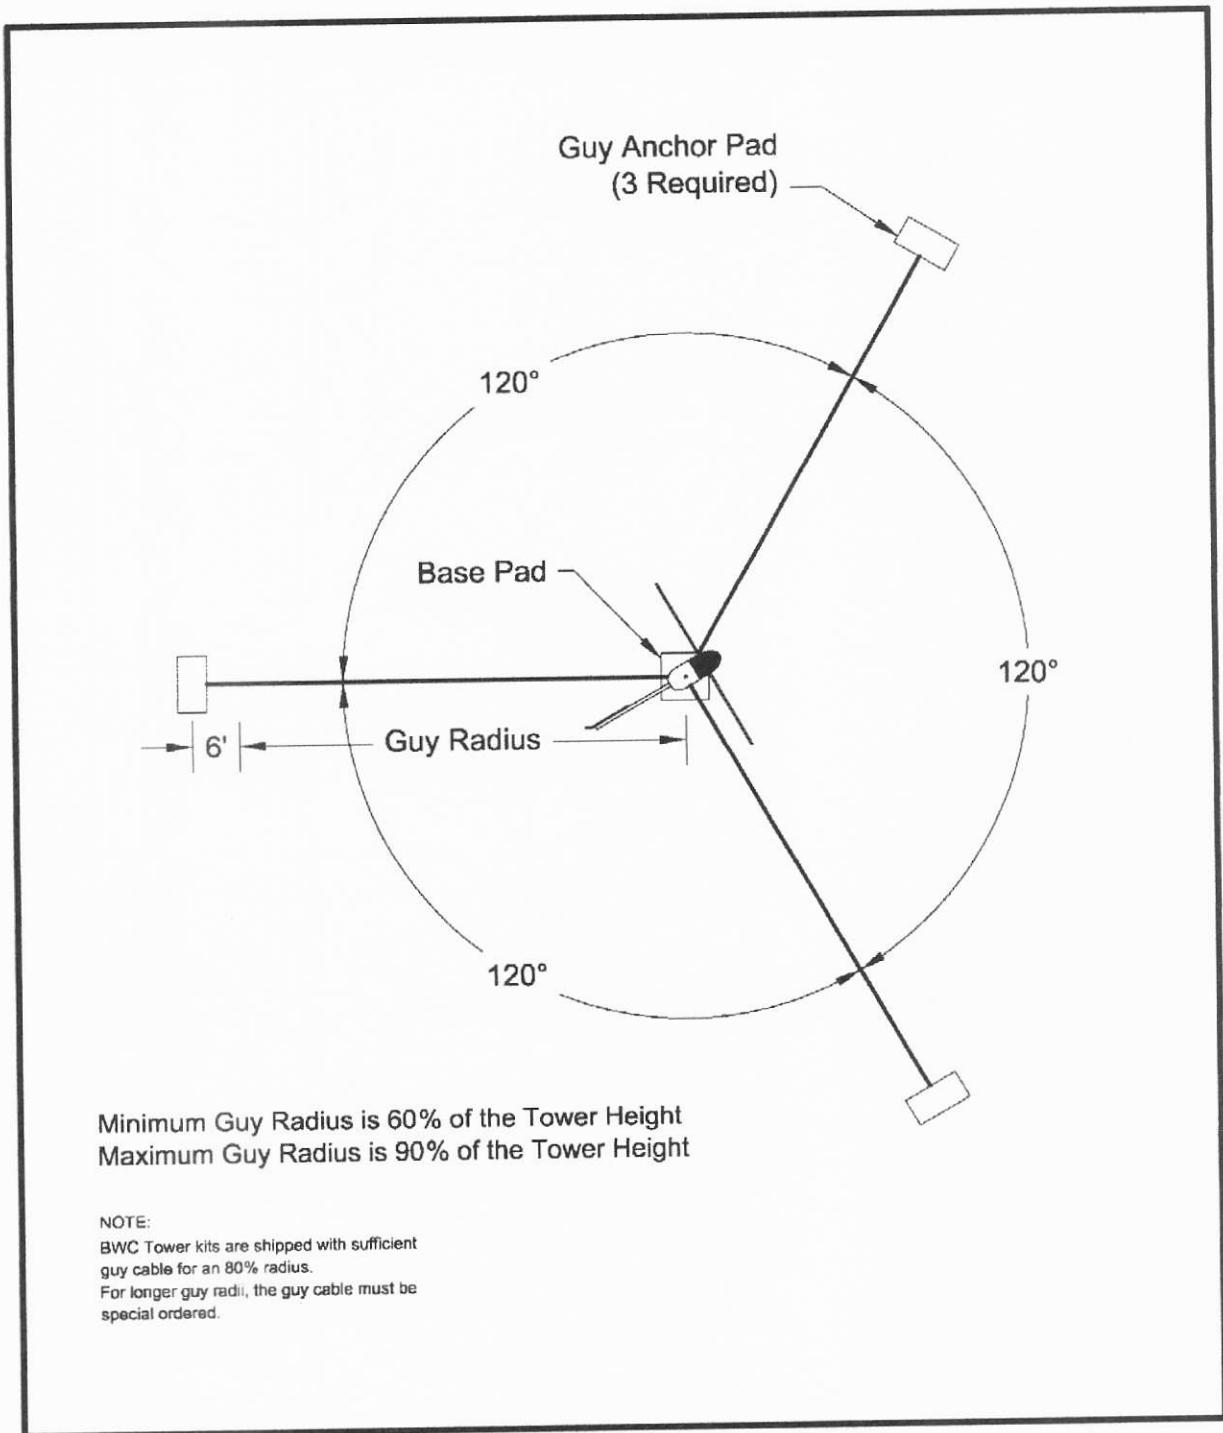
Nominal Foundation Layout for all BWC Guyed Lattice Towers
